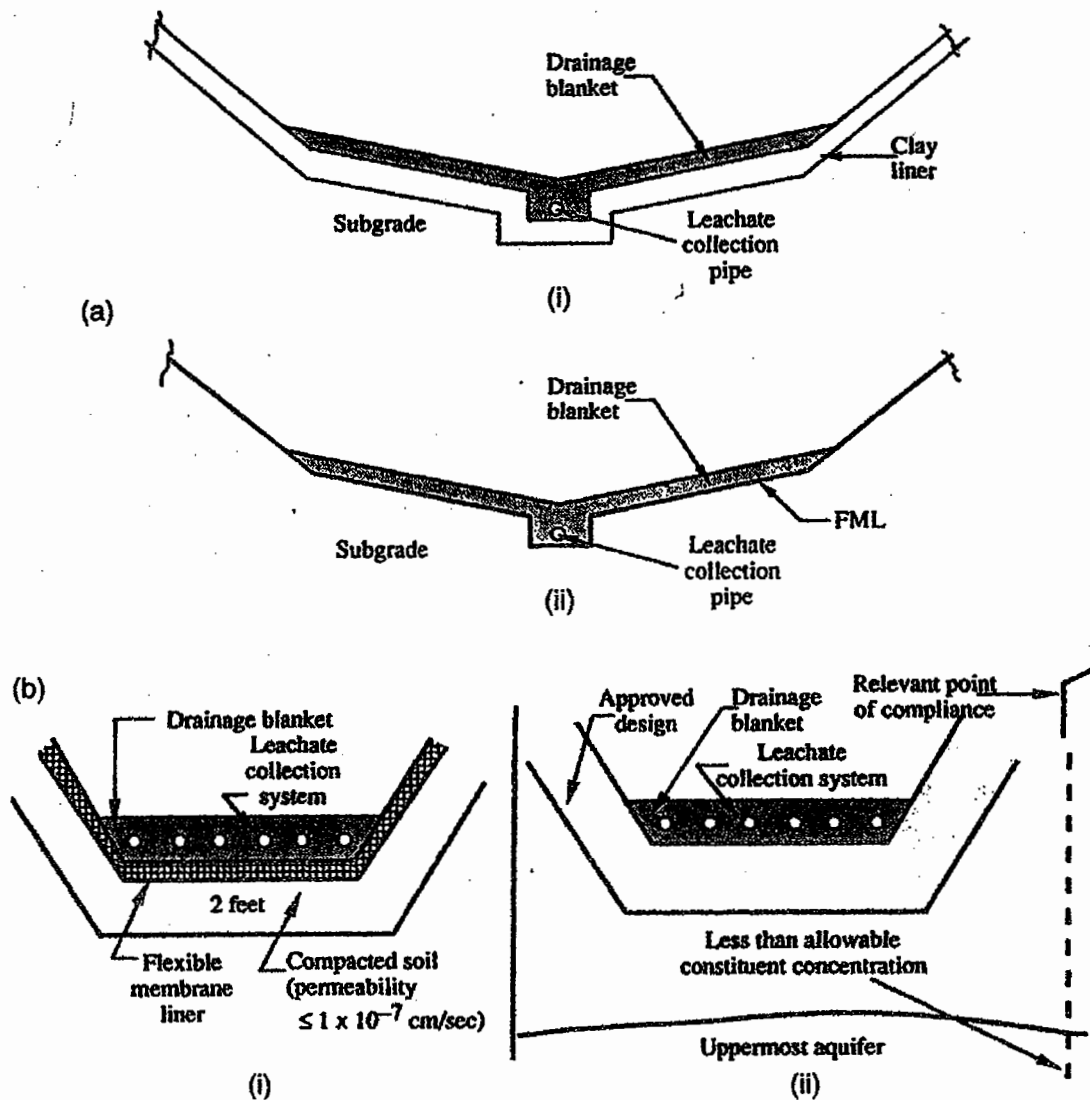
Details of Landfill Impervious Base Construction: (a) cross section of a single-lined landfill: (i) clay liner, (ii) flexible membrane liner (from Ref. 21); (b) design criteria for new municipal solid waste landfill (MSWLF) units and lateral expansions: (i) composite liner and leachate collection system, (ii) design that meets performance standard approved by state (from Ref. 18). Continued
